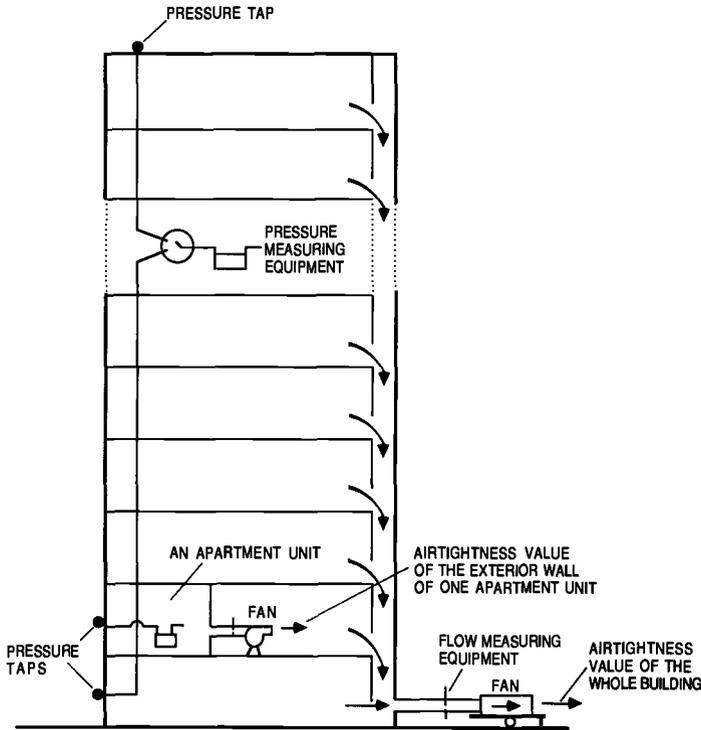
Building test setup showing the fan pressurization apparatus for measuring the airtightness values of the whole building and an apartment.
